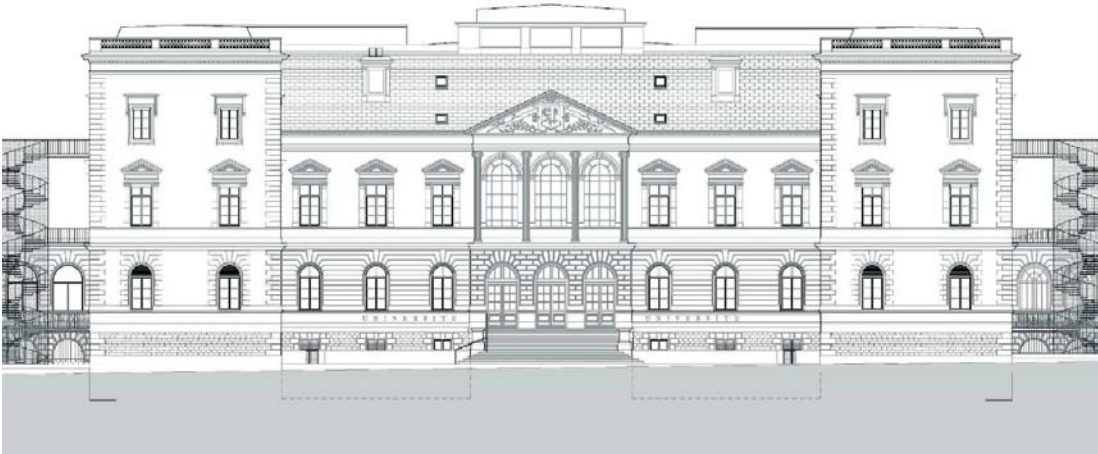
PROPOSED RENOVATION INCLUDING EXTERNAL STEEL FIRE ESCAPES
